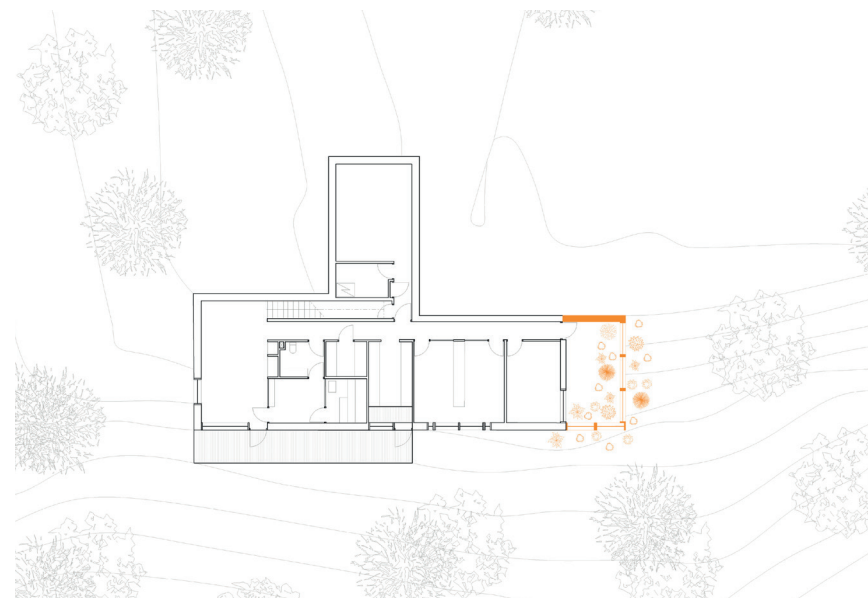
Original plan of Villa Sarvilahti by Archdaily. Altered by authors.
